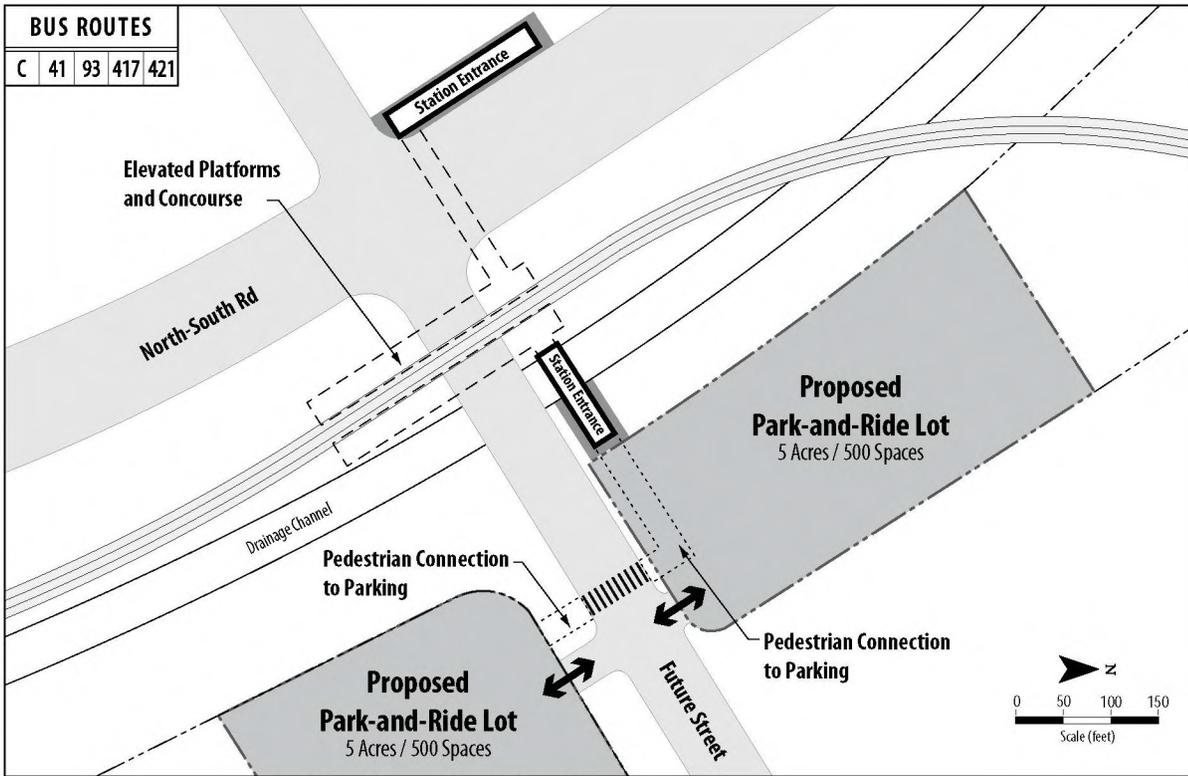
UH West O'ahu Station (All Build Alternatives)
